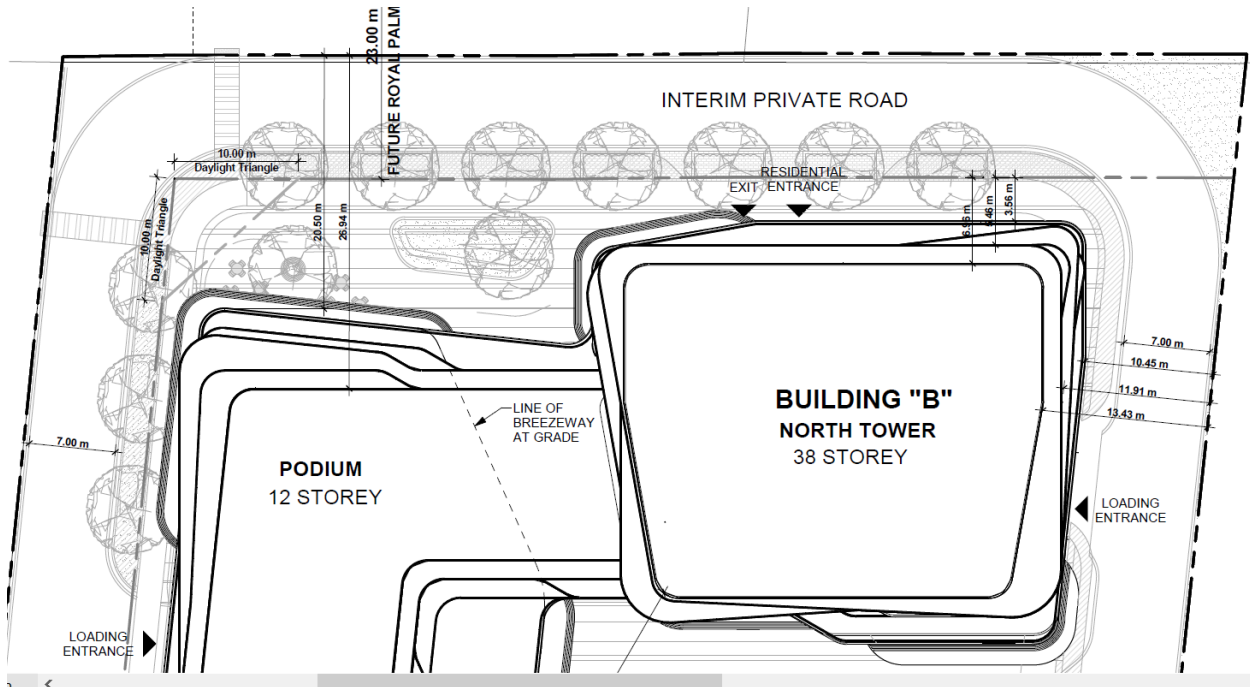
Site Setbacks – Building B North Tower (Source: Architectural Drawings, p. 7)
